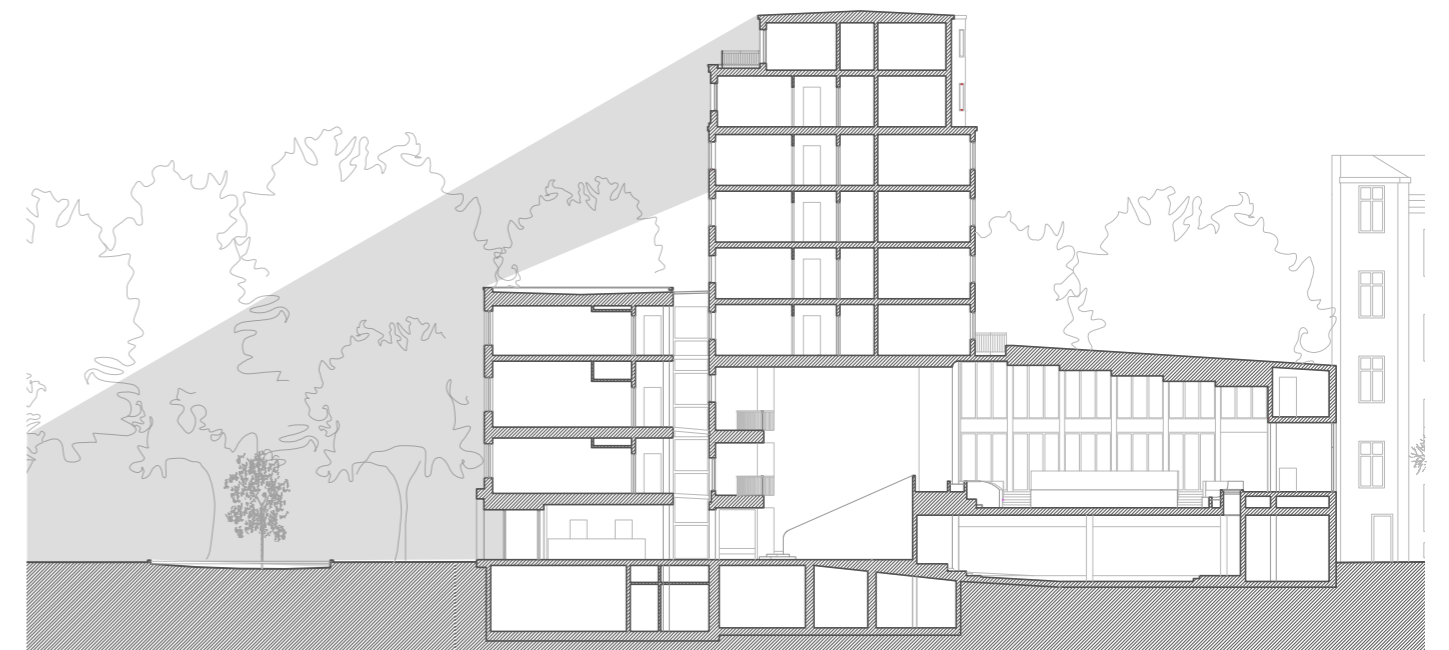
Vasastaden 1:4 seen from Hagaparken.
